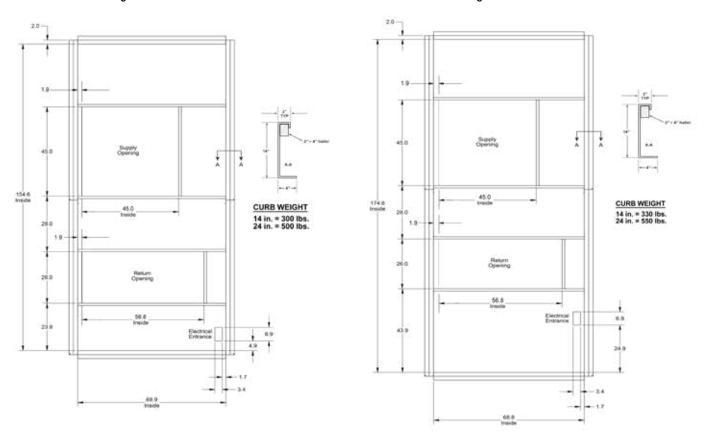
Roof Curb Assembly (DPS 007-015, 016-028) with CORE ERV
